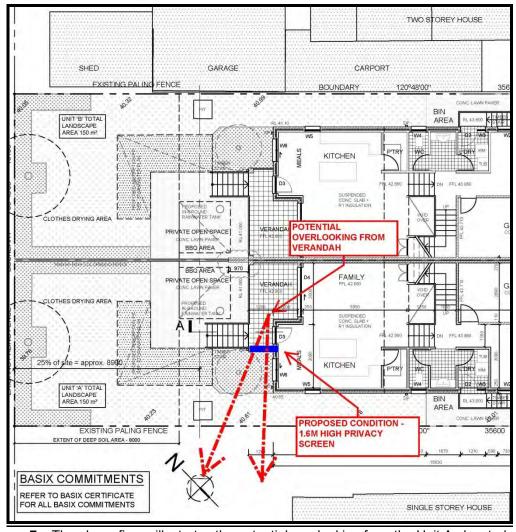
The above figure illustrates the potential overlooking from the Unit A elevated rear verandah and the privacy screen to be inserted by way of condition to minimise overlooking and maintain adequate visual privacy to the adjoining property to the south-west. Noted in this image also is that the adjoining property to the north-east includes garages and outbuilding adjacent to the Unit B verandah, and as such, visual privacy issues are not a concern in this location.
